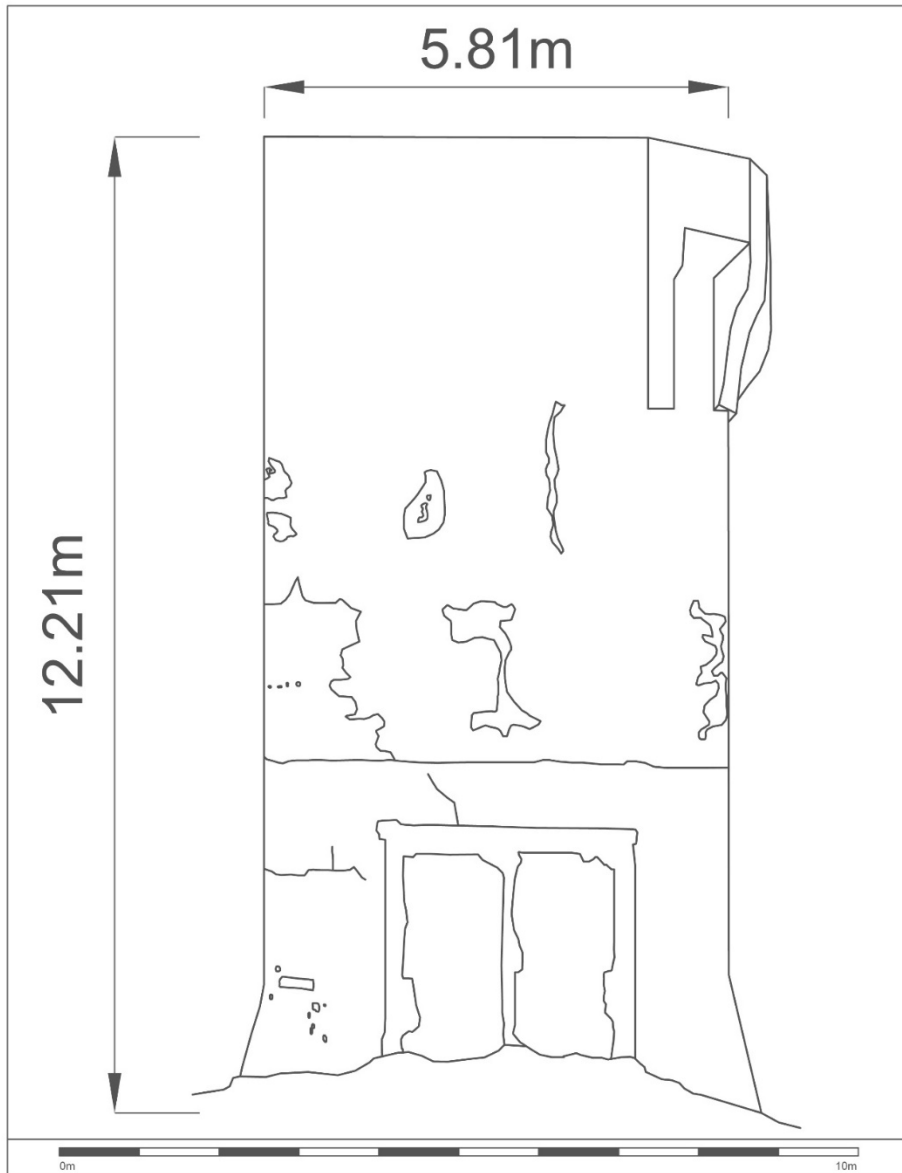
External elevation of the south-west wall of the heavily modified signal tower at Malin Head Signal Station.
